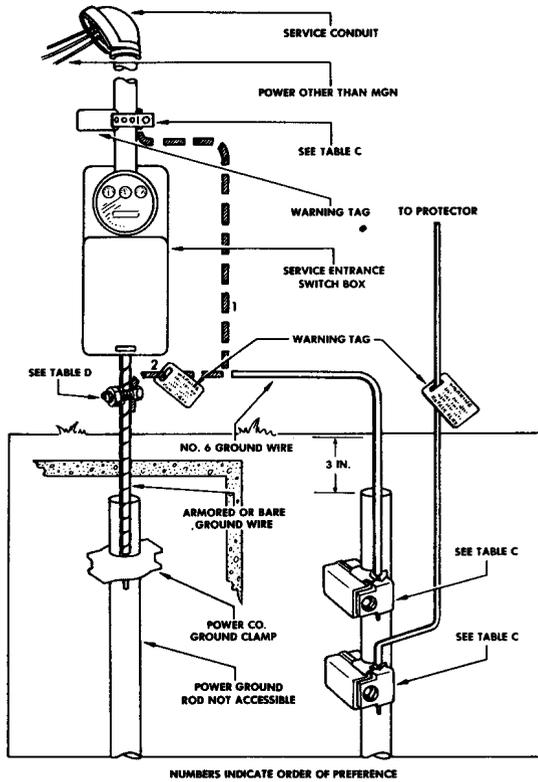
Power Other than MGN Grounded to Inaccessible Ground Rod—No Water Pipe
